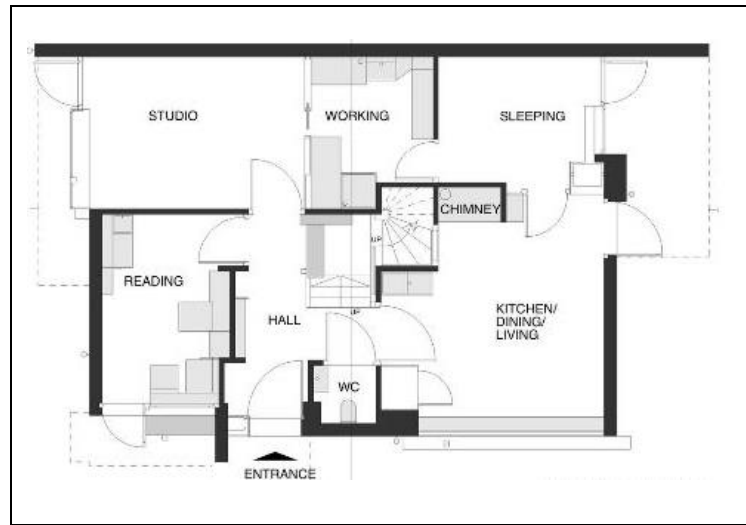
Ground floor plan of Rietveld Schröder House [47].
